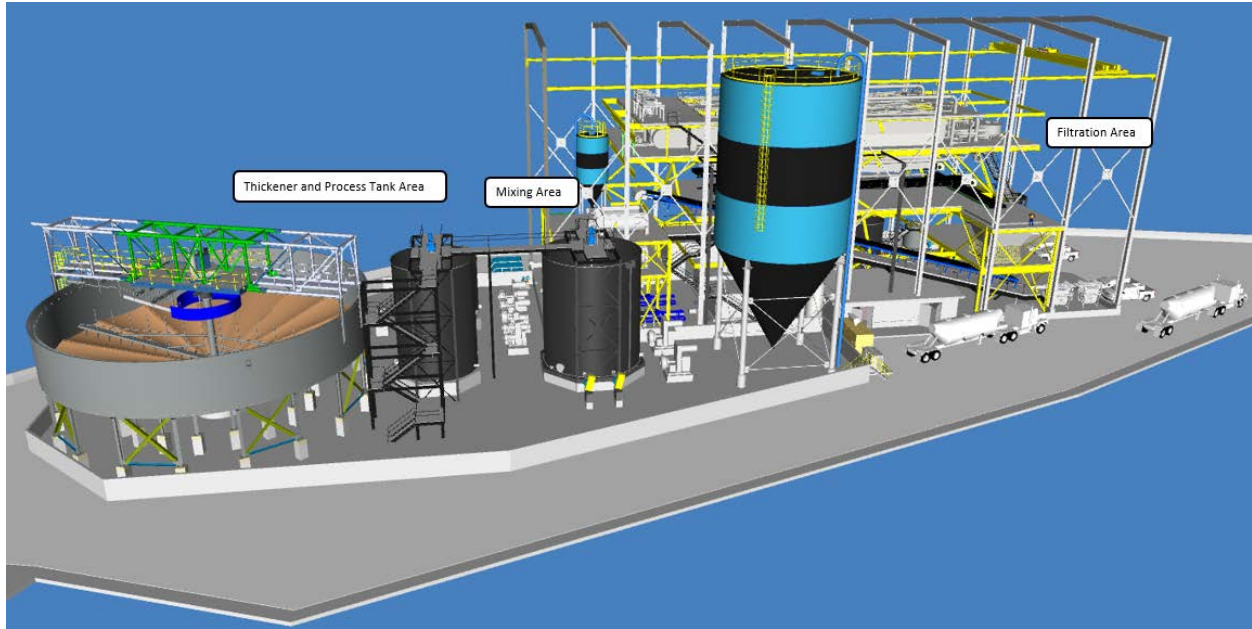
Paste Plant - Labelled 3D Model Looking Northeast
